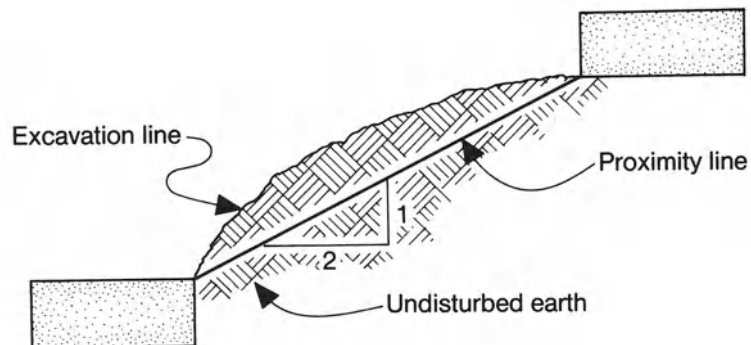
Recommended proximity line between adjacent footings of different elevation.
